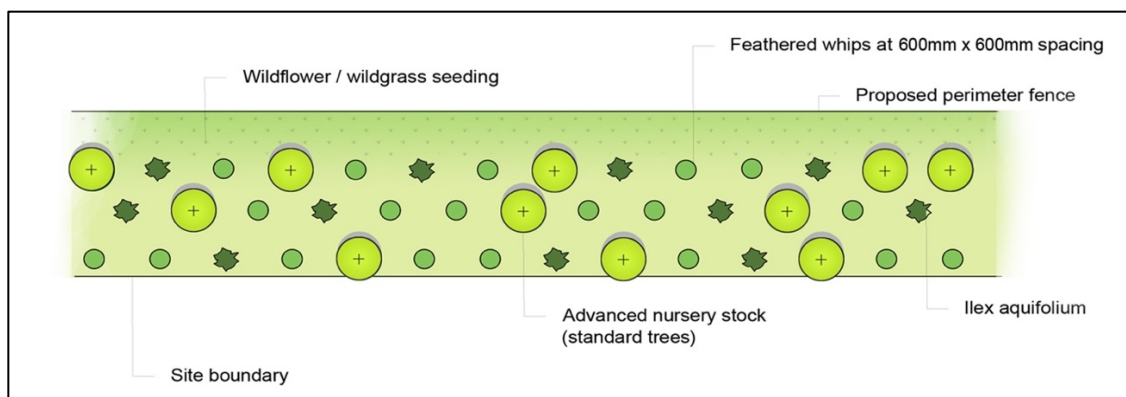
Indicative boundary planting detail showing the introduction of new boundary hedgerow TYPE 2
